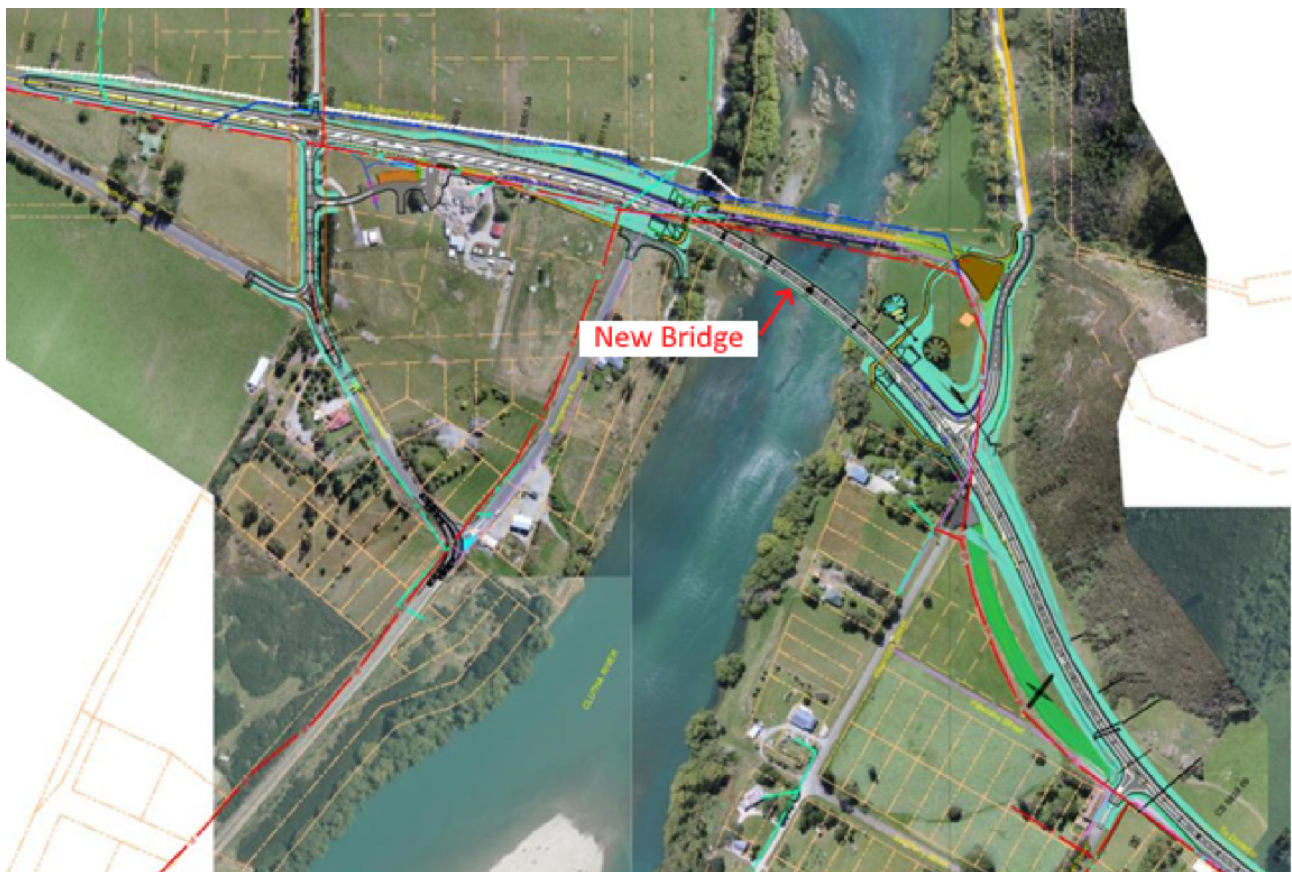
Image of the proposed new bridge and the realignment of SH8.
